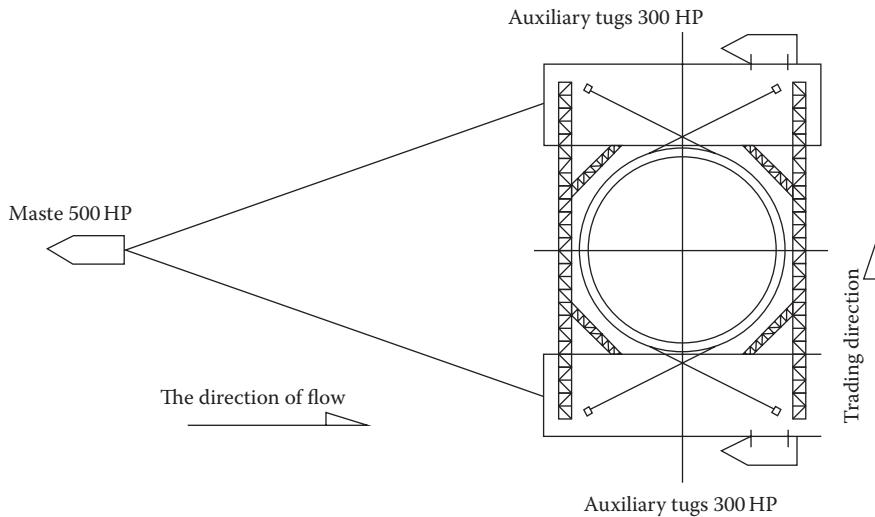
Floating transport of steel cofferdam, Wuhu Bridge (Wuhu Yangtze River Bridge double-wall steel cofferdam construction).
